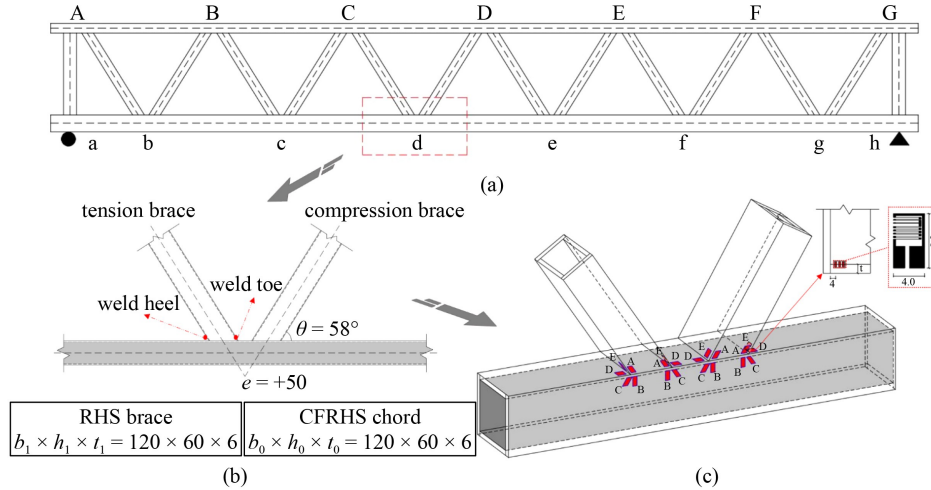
Geometry of specimen and arrangement of strain gauges (unite: mm). (a) General arrangement of truss girder; (b) test joint diagram; (c) measuring-point arrangement of HSS.
